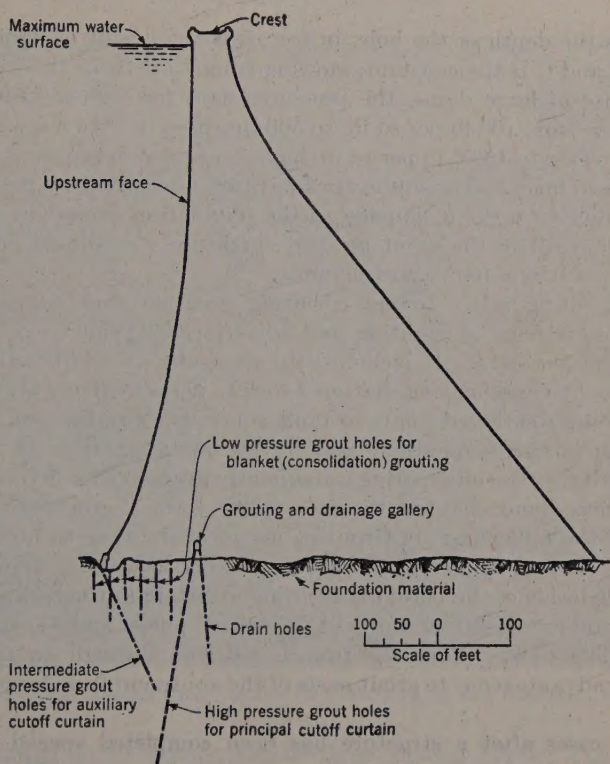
ZONES OF PRESSURE GROUTING BENEATH A LARGE DAM
